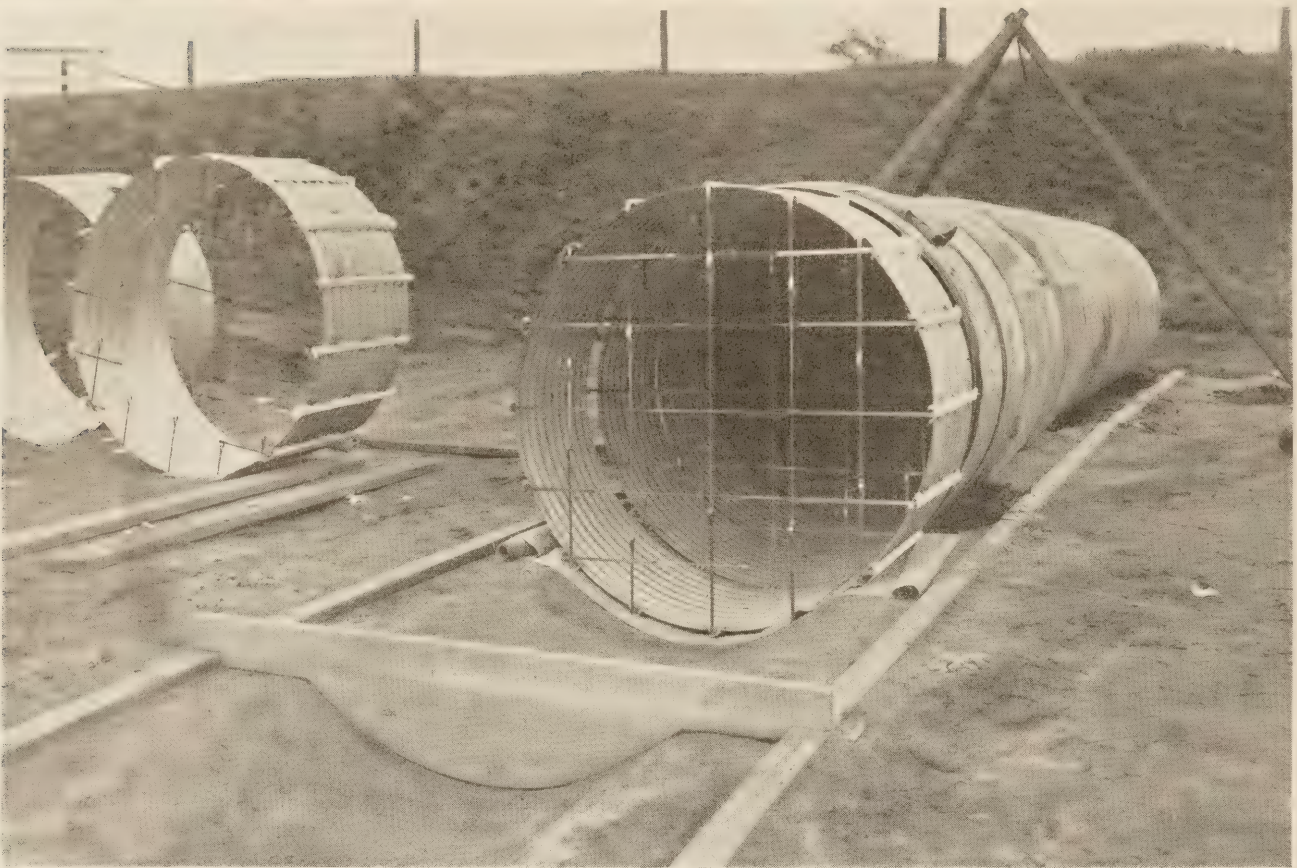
SECTIONS OF CULVERT PIPE ON WHICH RIBBONS ARE BEING INSTALLED TO MEASURE VERTICAL AND HORIZONTAL EARTH PRESSURES.
